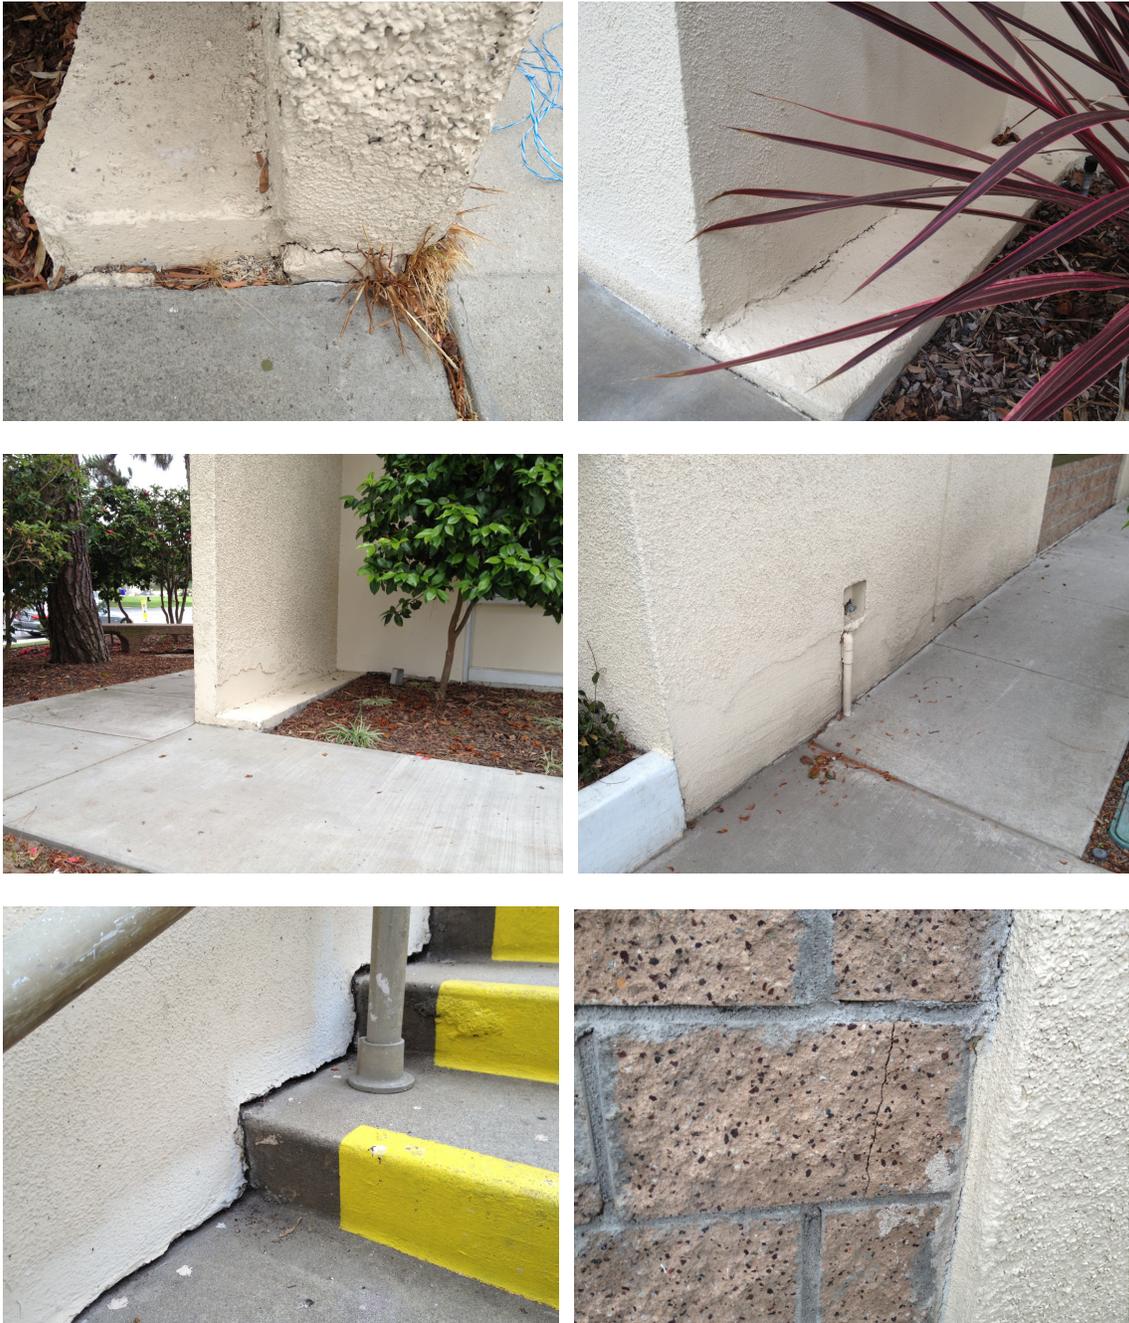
Settlement and Cracking in Exterior Walls
